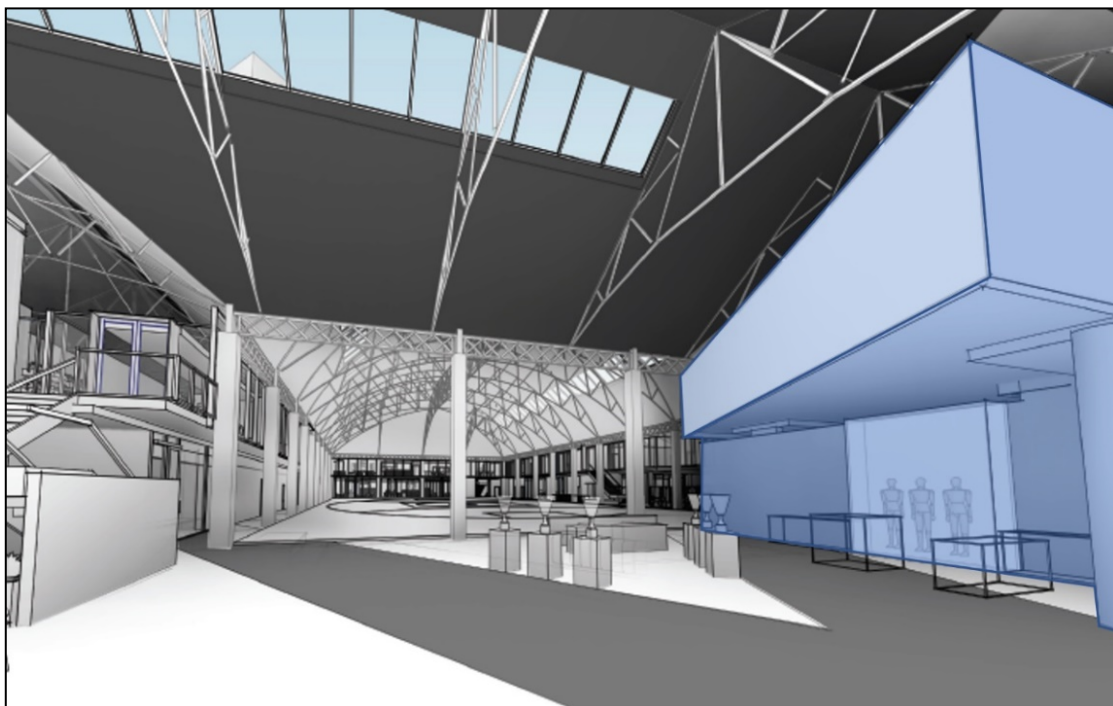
| Image showing proposed floorspace in the north west corner of the RHI (blue) (Base source: Applicant's RRFI).
